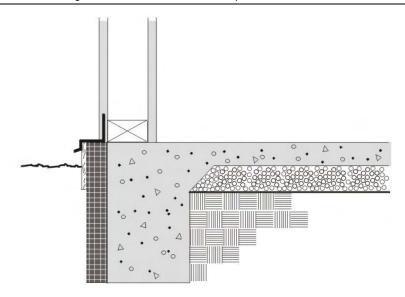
Unheated Slab-on-Grade Floor
